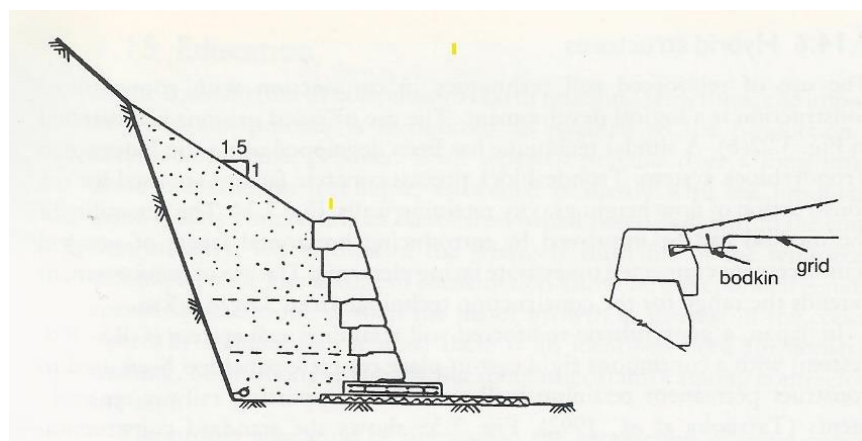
Reinforced soil hybrid wall, based upon Tronderblock precast facing (Jones, 1996).
